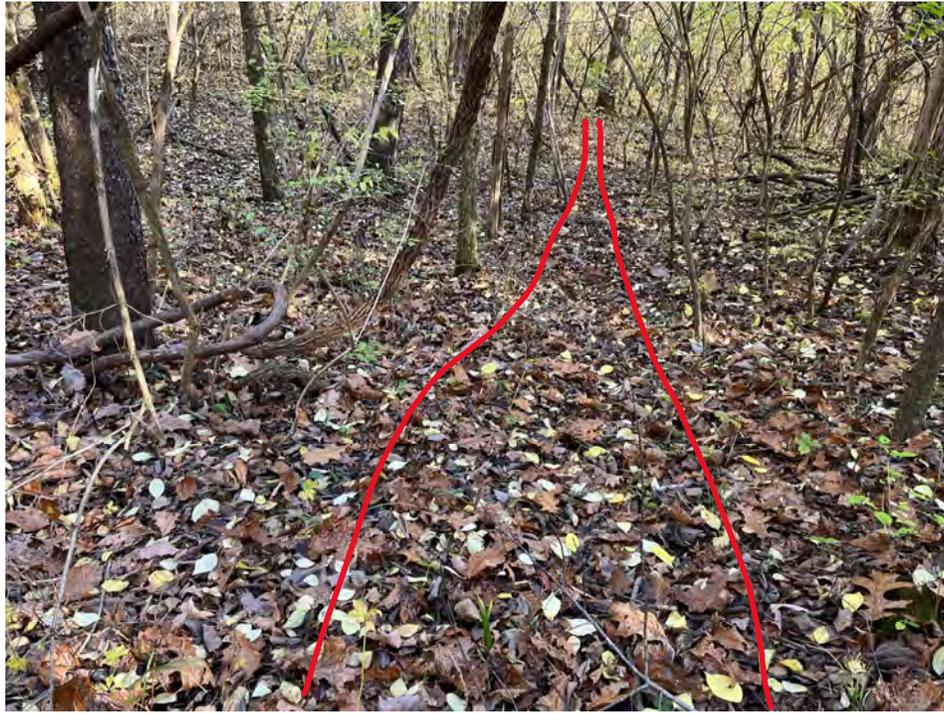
View of drainage swale directed downslope of slope failure area SF-01.
